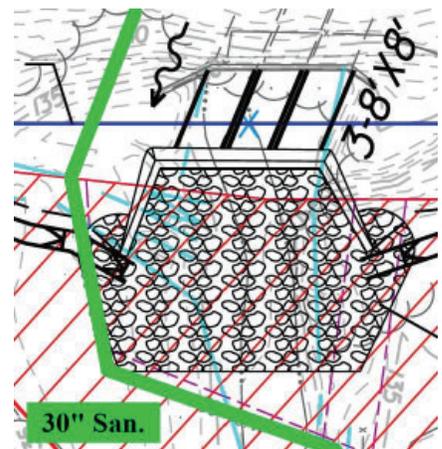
Triple Box Culvert Wingwall Modification
